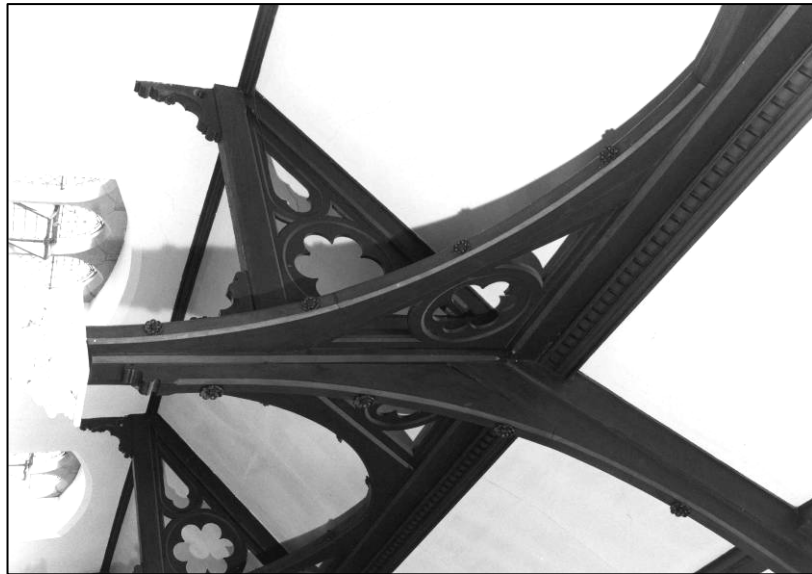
Church: 1F gallery, typical cusped braces (W side), looking NW (photo 4/13) (top to right).
